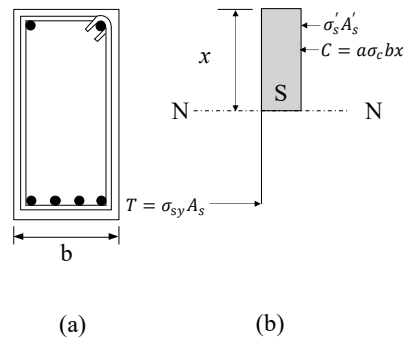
Normal beam: (a) cross section; (b) schematic diagram of the balance of forces.
